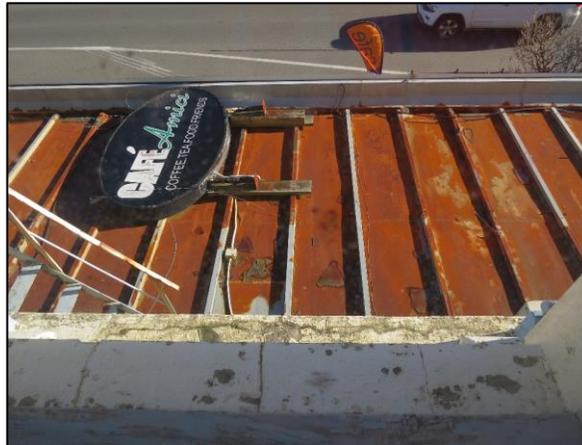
Verandah, details of flashings, probably on beam with original roof removed, taken from first floor
